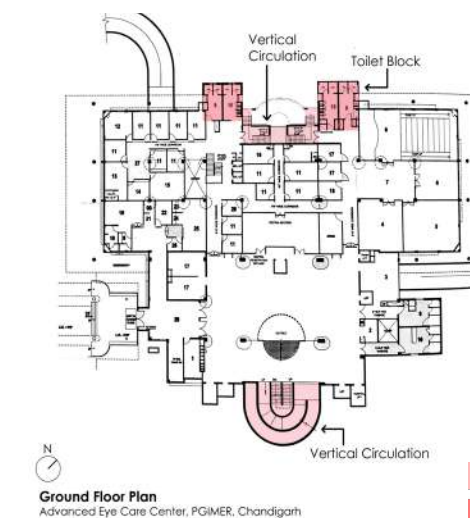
Diagram showing the service block in the Ground Floor Plan at Advanced Eye Care Center
